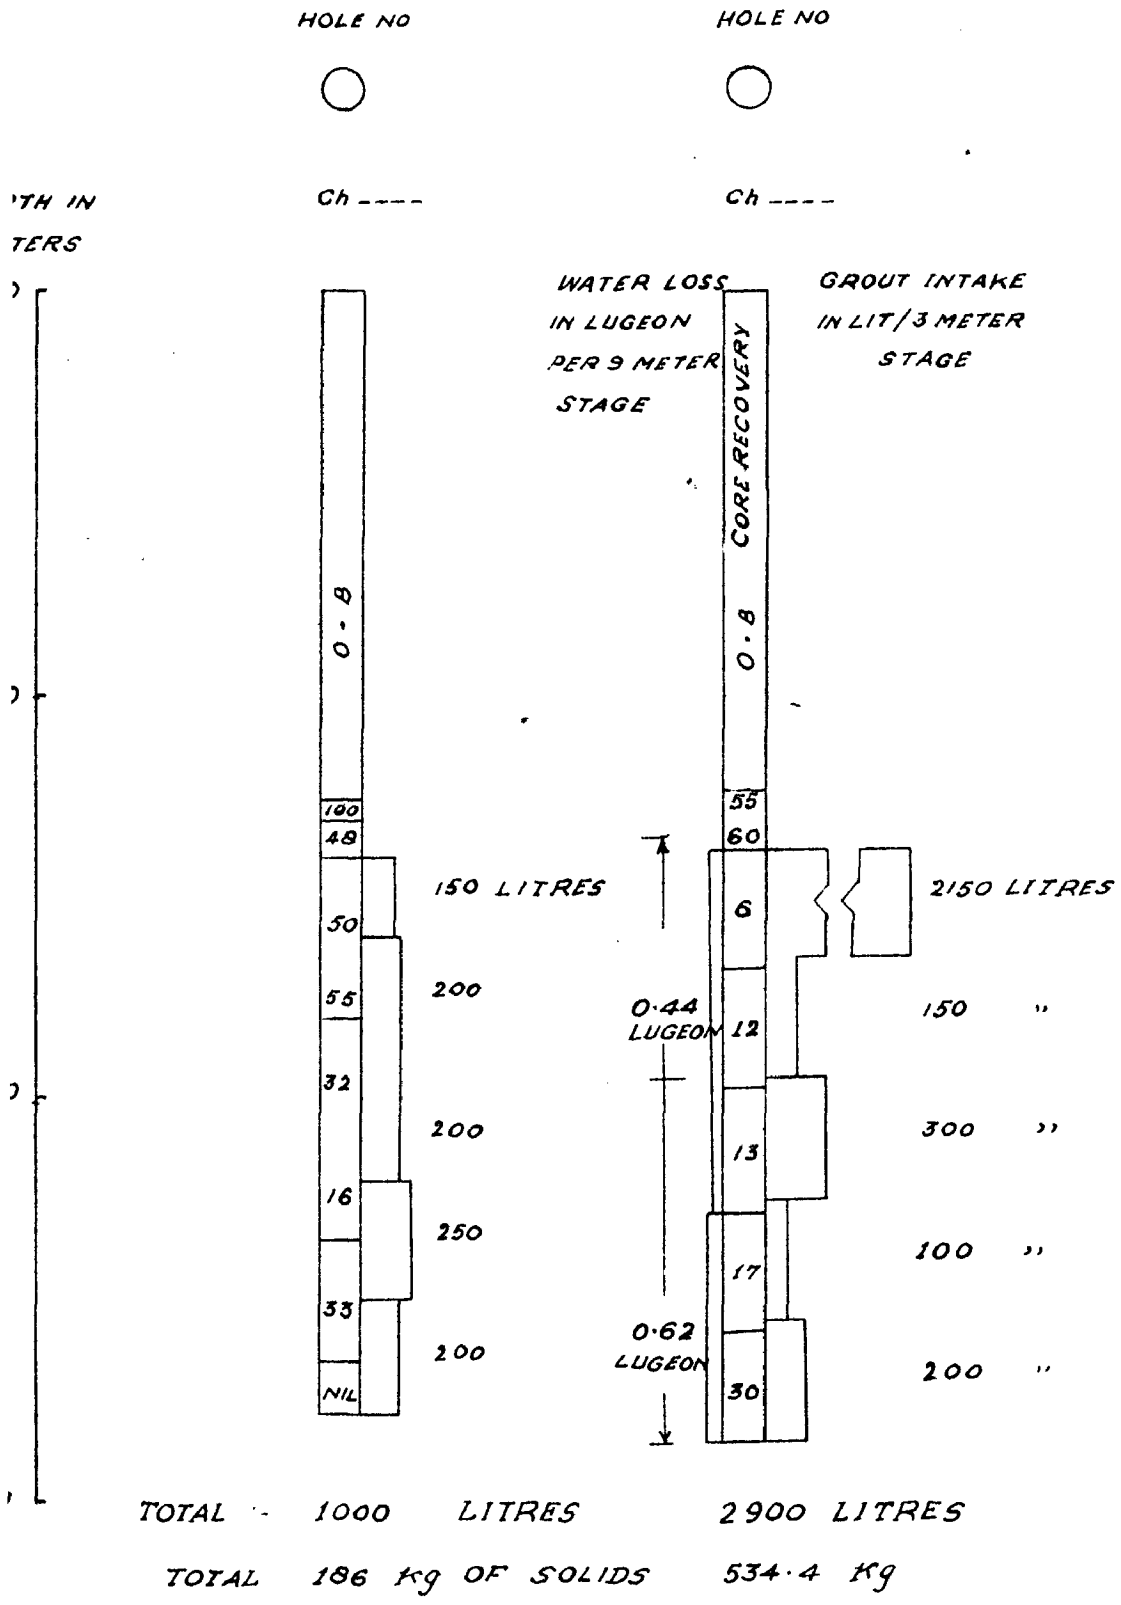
SHOWING THE DRILLING AND GROUTING DATA OF GROUT HOLES
